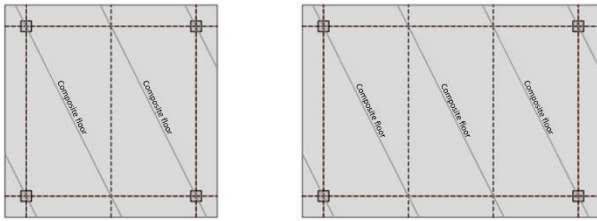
Examples of possibilities for placing precast concrete plates between two columns. [1]
